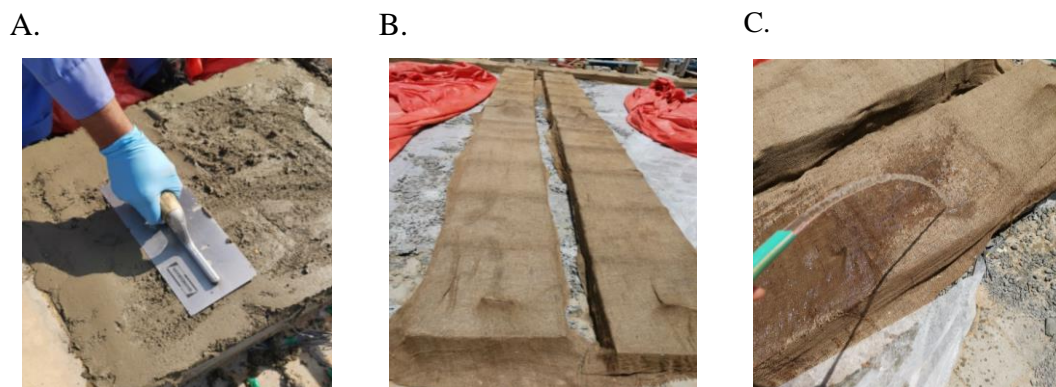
Finishing and curing: A. Leveling the concrete surface, B. Beams covered with burlaps, C. Spraying water for curing
